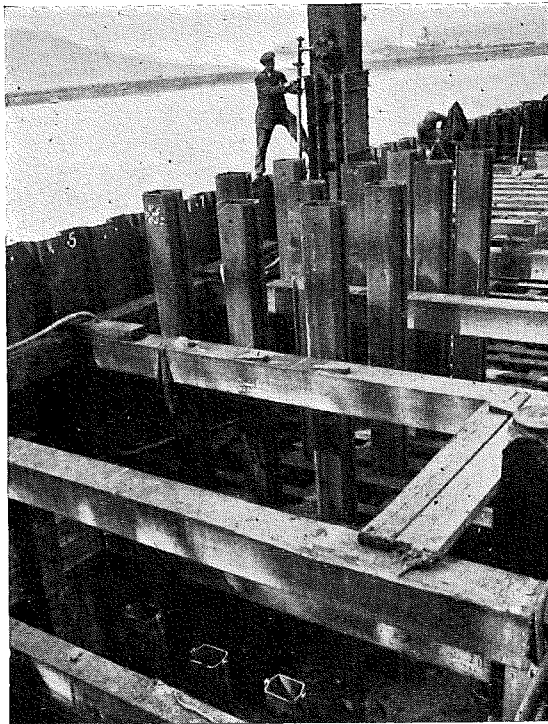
DRIVING STEEL-SHEET BOX PILES INSIDE COFFERDAM ILLUSTRATED IN FIG. 78.
